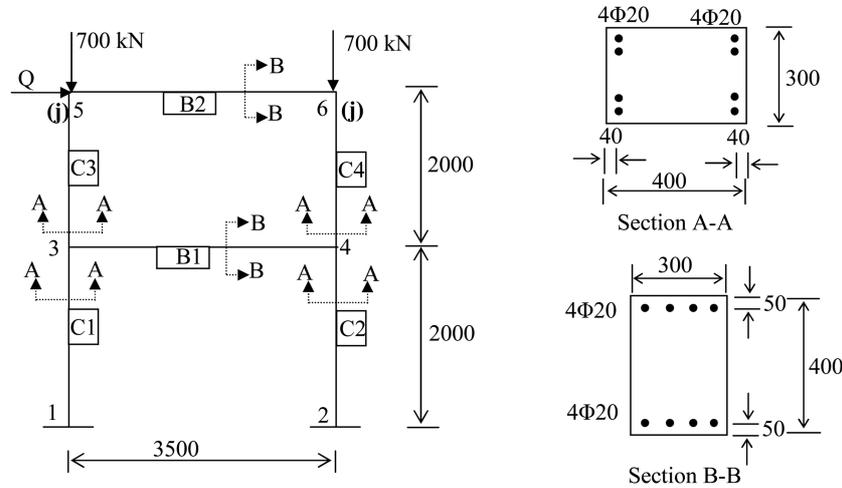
Dimensions of reinforced concrete frame model, (dimensions in mm), (Vecchio and Emara 1992)
